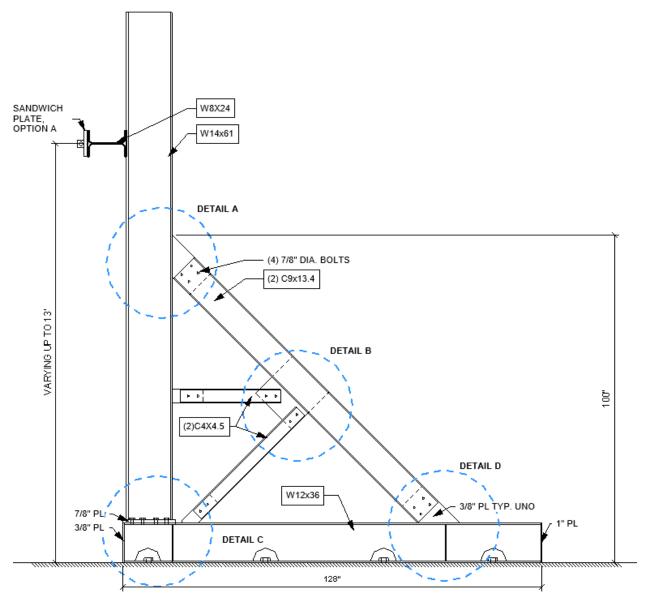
Side Elevation of Reaction Frame. (For Front Elevation, see Figure 6. Details in Figures 2-5)
